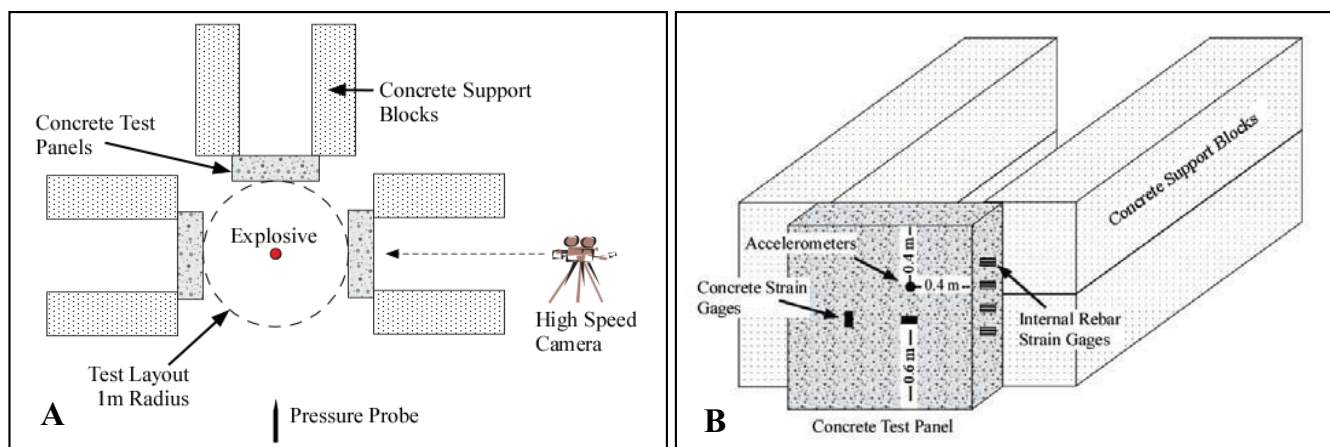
(A) Test layout plan view (B) Instrumentation details. Note that the concrete strain gages and accelerometers were installed on the back face (with respect to the blast) of the concrete test panel. The internal rebar strain gauges were installed during casting of the concrete.
